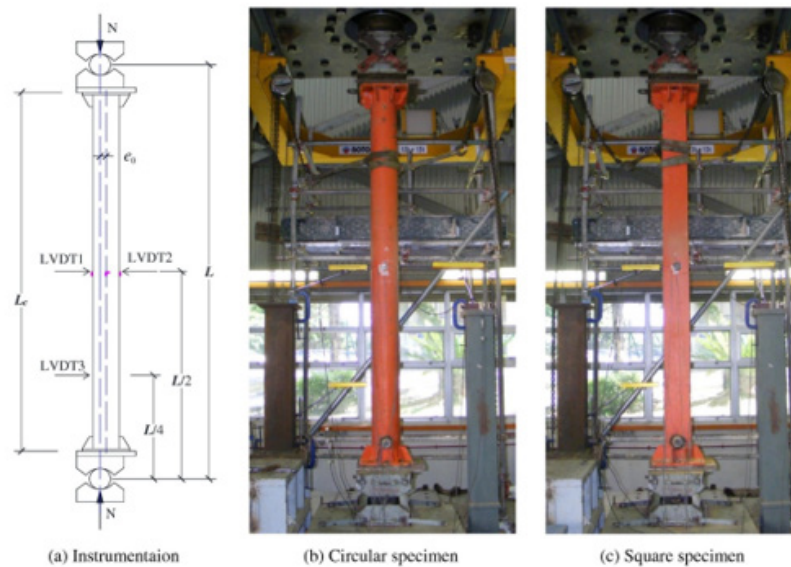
Impact load experimental setup on CFST's by Xiong et al. [152], where (a) is a schematic drawing of the instrumentation, (b) Circular CFST section specimen and (c) Square CFST section specimen.
